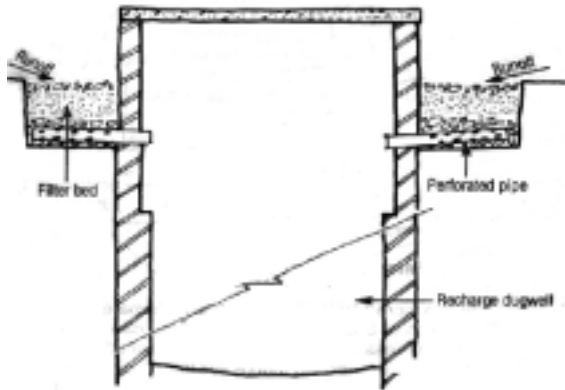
Recharging ground water aquifers from roof top run off
